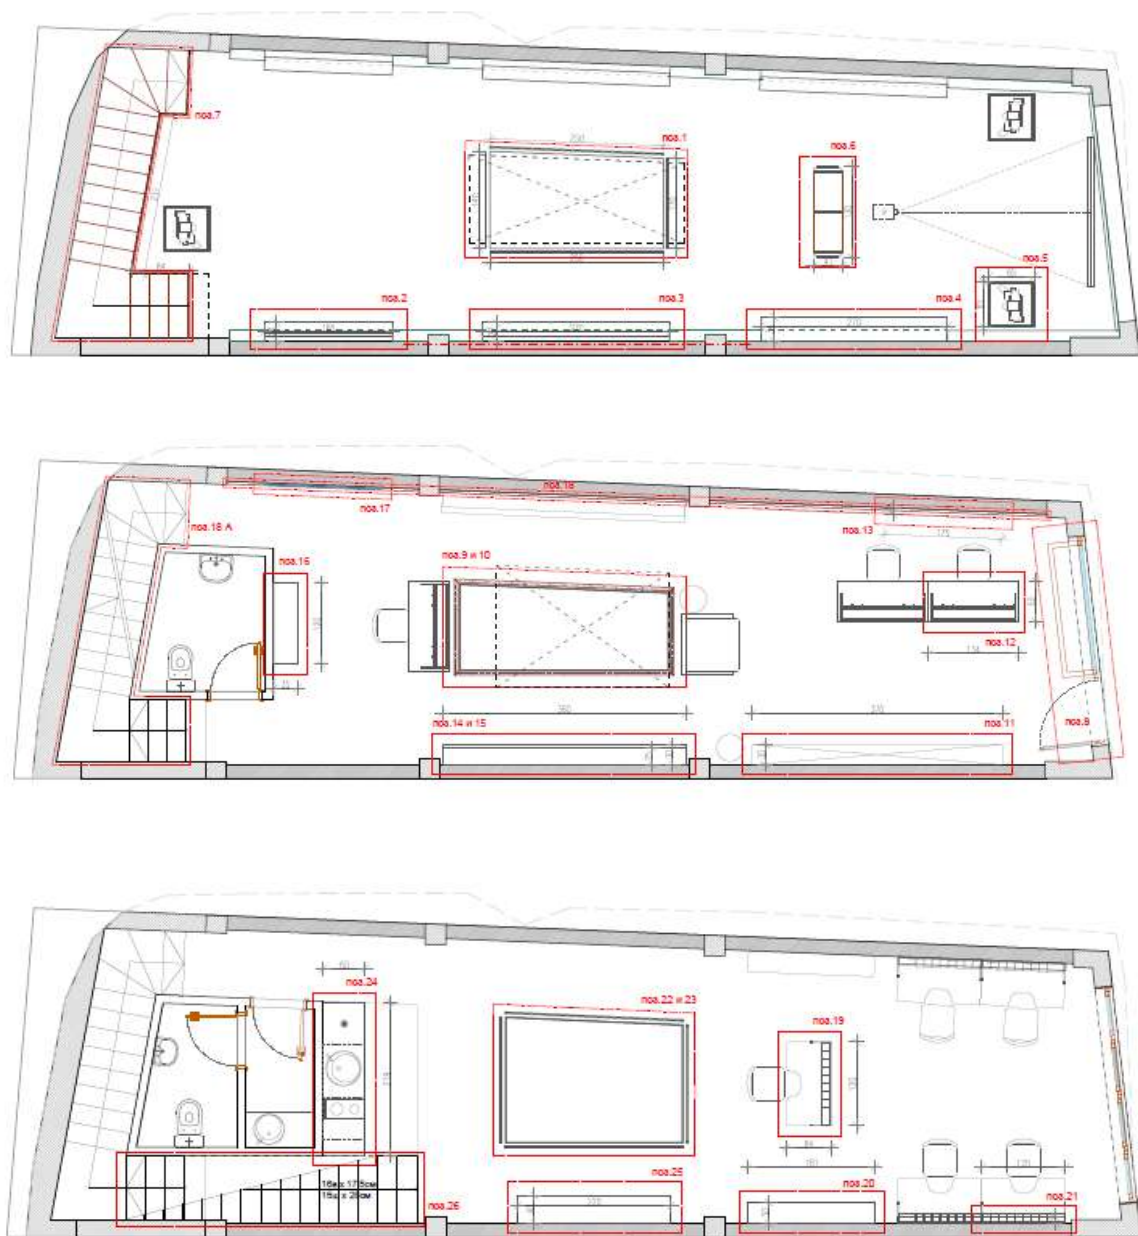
Situation of basement, ground floor and first floor with furniture according to new detail design (functional solution)
